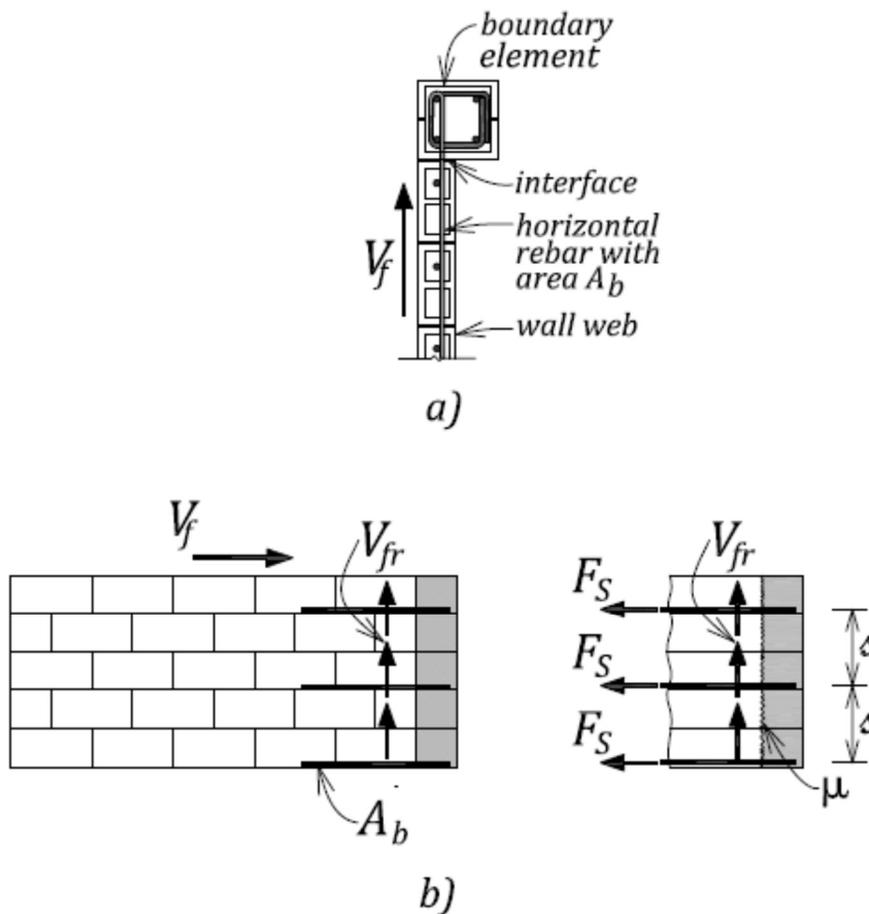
Shear flow at the interface between a boundary element and the wall web: a) a cross-section showing the intersection, and b) an elevation showing horizontal forces providing the vertical shear flow resistance.
